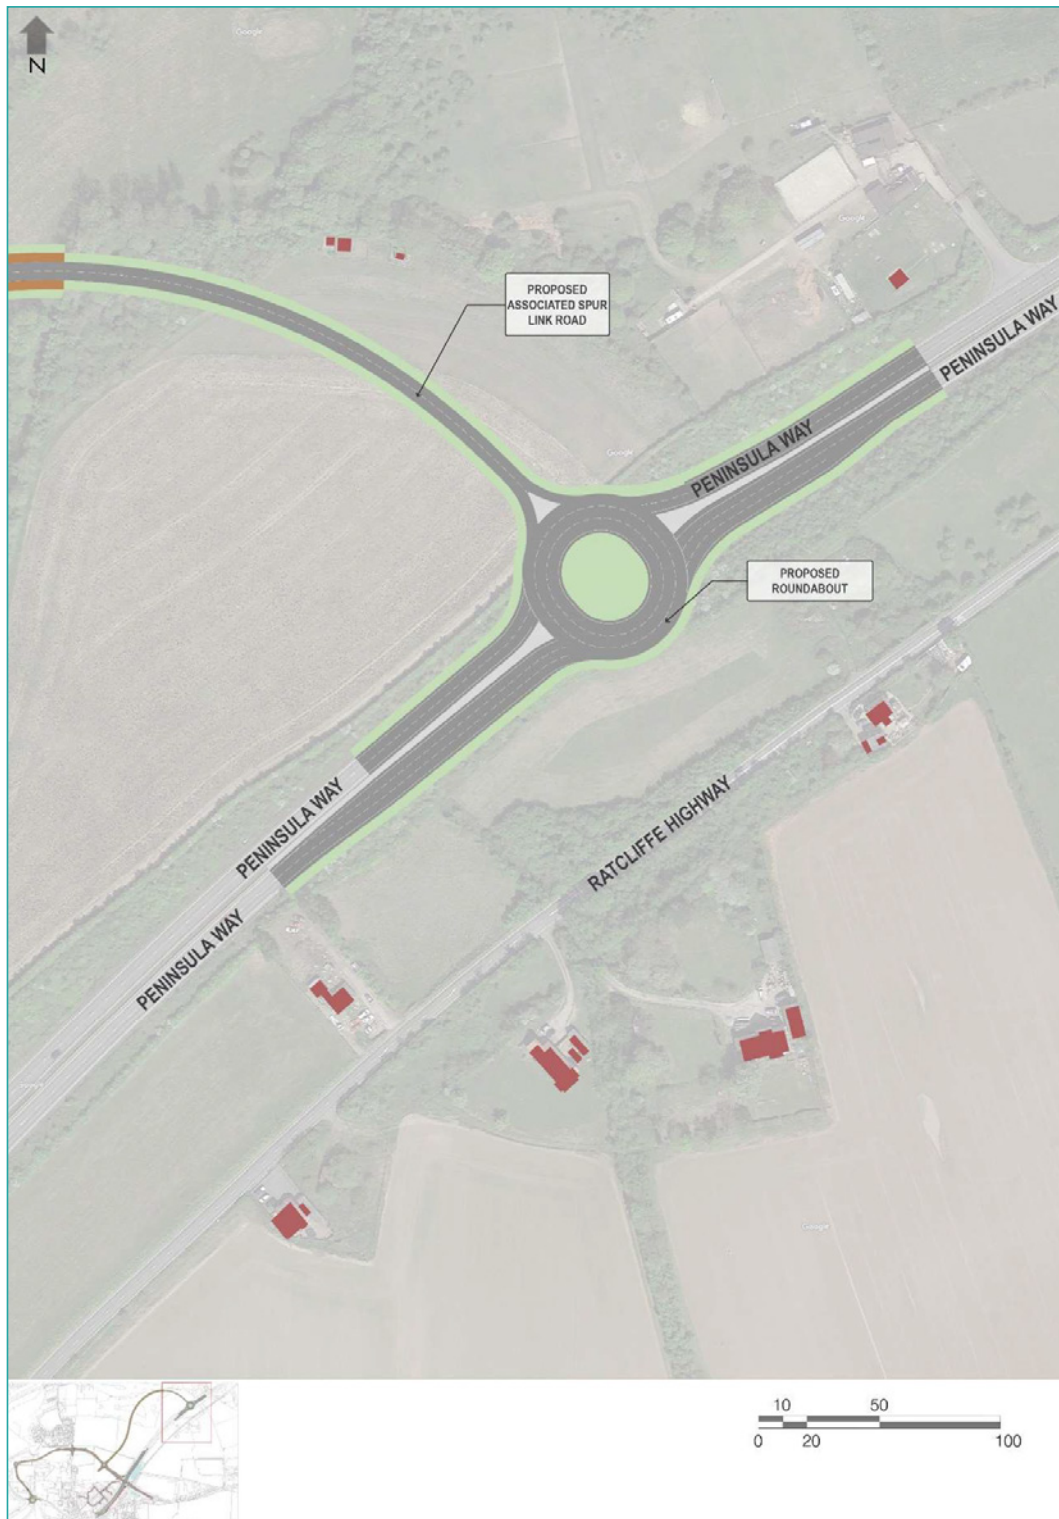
Phase 2 - Proposed A228 Roundabout and associated spur link road
